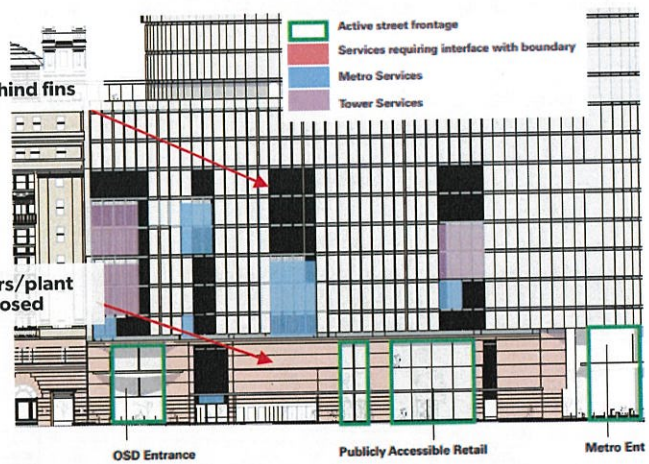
| Elevation plan showing enclosed plant and services along Elizabeth Street (Source: Applicant’s Rts)
